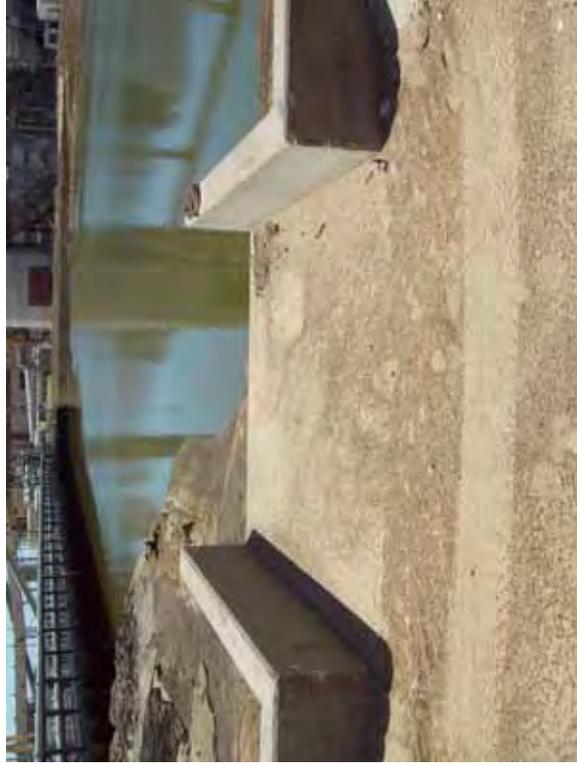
SP - Spillway between SRH Pond and South Bottom Ash Pond at west embankment exterior slope, looking west.
